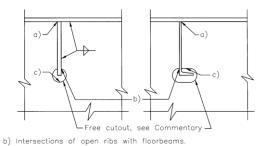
Detailing Requirements for Orthotropic Decks
